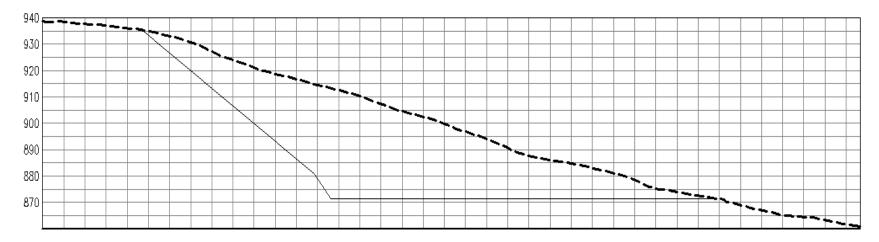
Embankment longitudinal section and initial excavation design for Section 02
